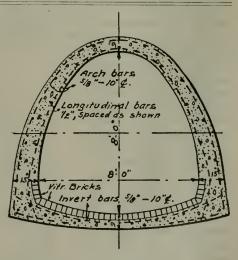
CONCRETE SEWER WITH SLIGHT REINFORCEMENT, ALBANY, N. Y.
